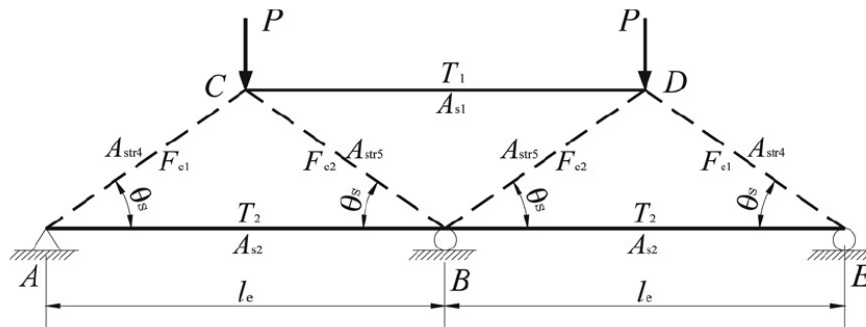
Truss Model for Two-Span Continuous Deep Beam
